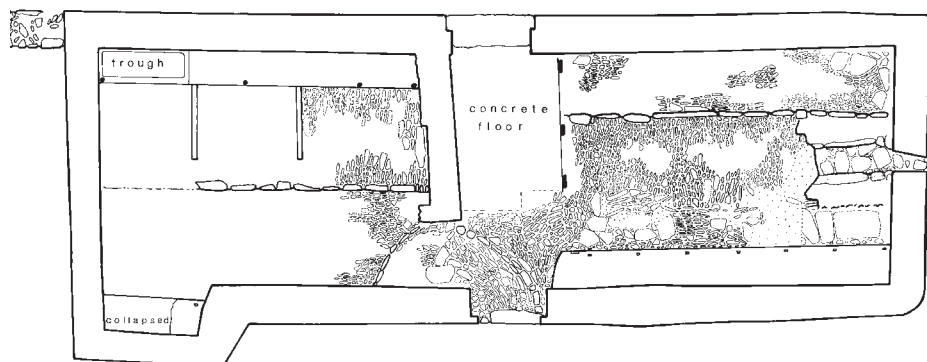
Buckfast Abbey. 14th century stable floor. Stewart Brown.
